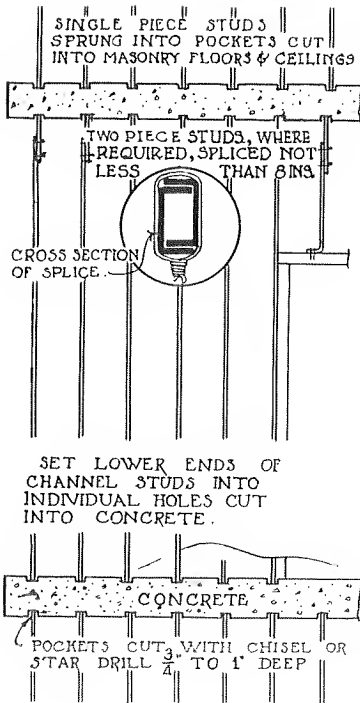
Anchorage in flat slab concrete floors and ceilings using notching method.
